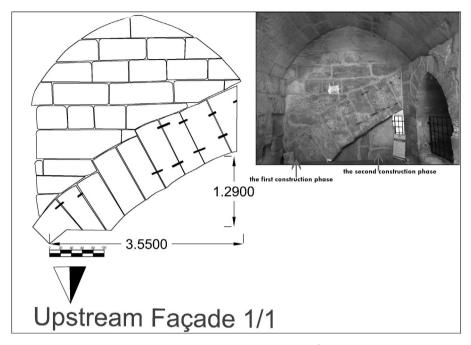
Drawing of the Upstream Façade (Drawing: İlkay Göçmen).
